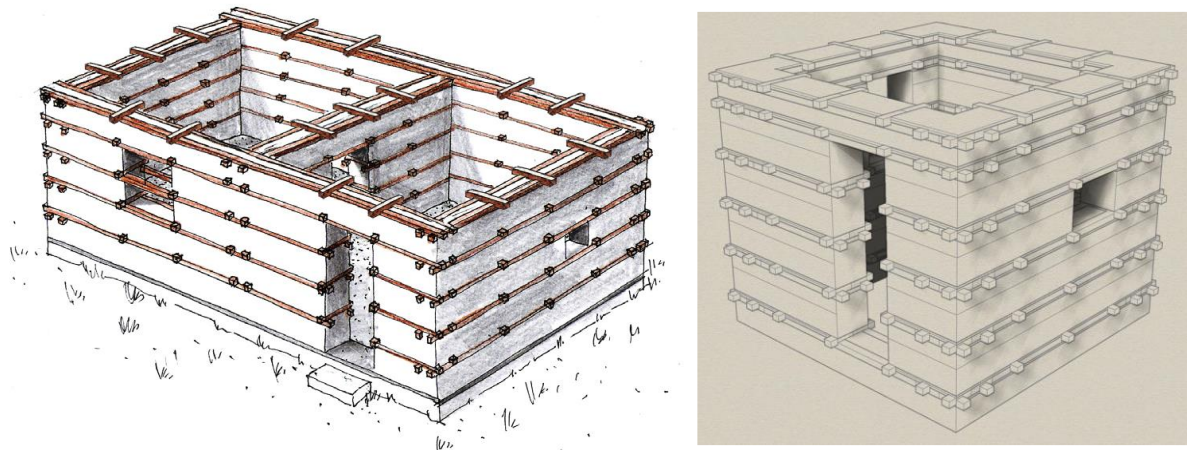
A typical Bhatar house : a) Two-room structure [107], and b) One-room structure [63]
